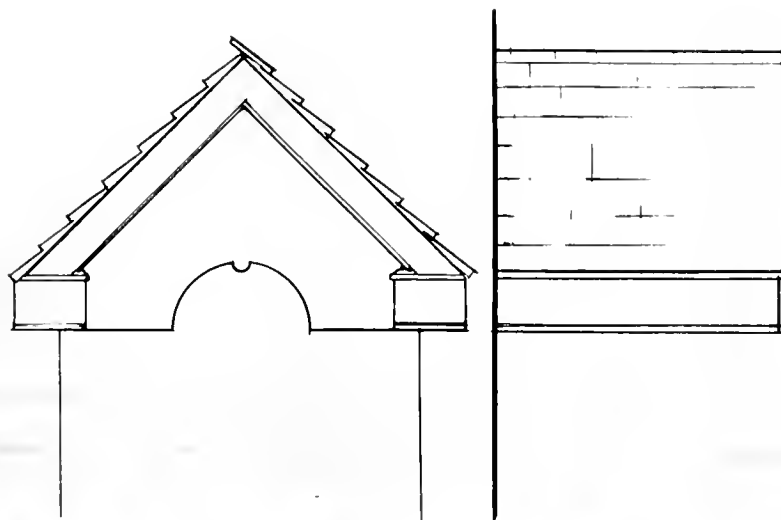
Hood over dining room door, front and side elevations (surveyed and adapted from Okie prints).
